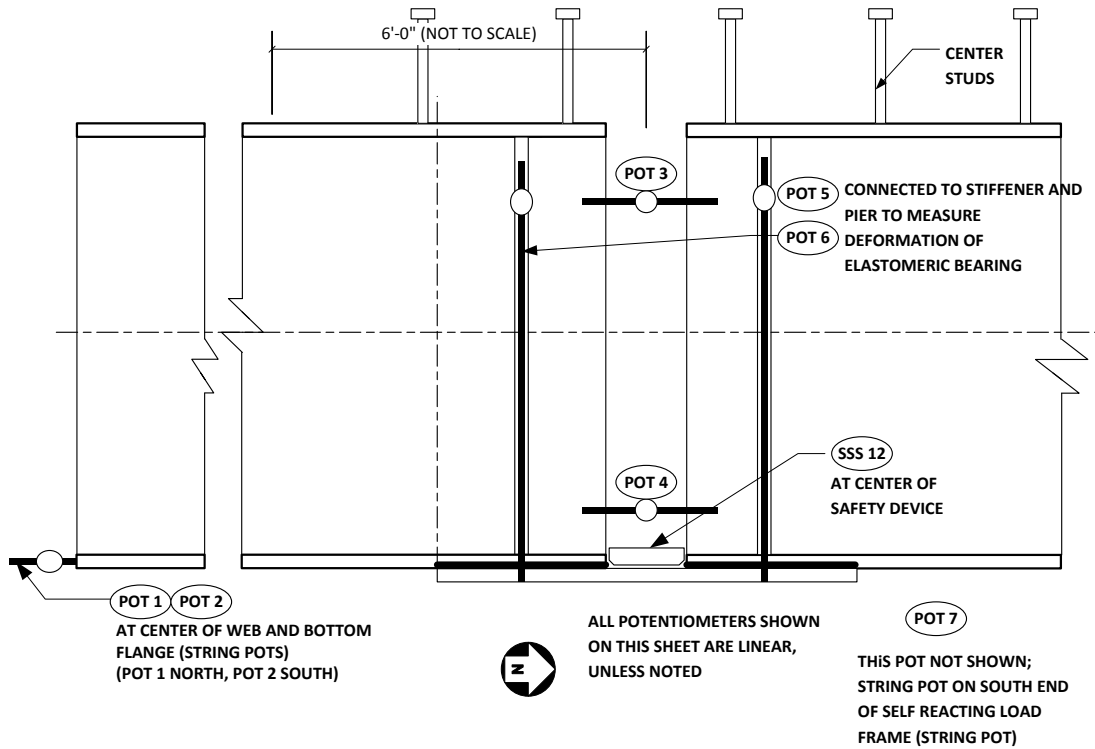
Instrumentation Layout at the Girder Ends – 1
